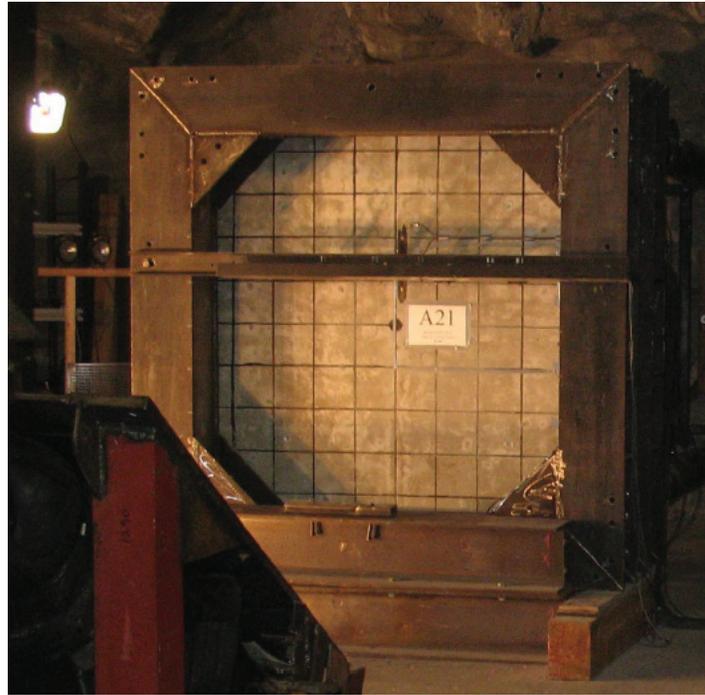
The concrete wall (typical) mounted on frame and ready to be tested for impact load
